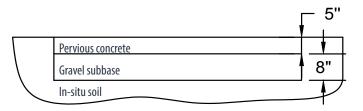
A cross-section view of the pervious concrete paving system. The proposed design recommends a 5-inch pervious concrete layer, supported by 8-inches of gravel subbase. The pervious concrete profile has the capacity to store stormwater from the 10-year, 24-hour storm while providing adequate structural support for pedestrian traffic and emergency vehicles.
